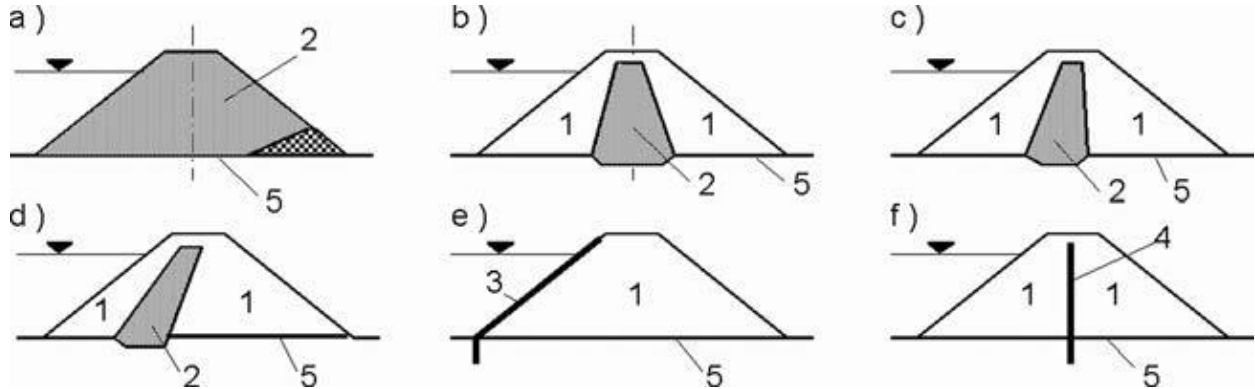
Basic types of embankment dams. (a) Homogeneous body; (b,c,d) zoned body; (e) with impermeable face lining, and (f) with an internal core wall made of artificial material, (1) permeable earthfill material; (2) impervious earth material; (3) impervious facing; (4) diaphragm wall core made of impervious artificial material; (5) impervious foundation. [12]
